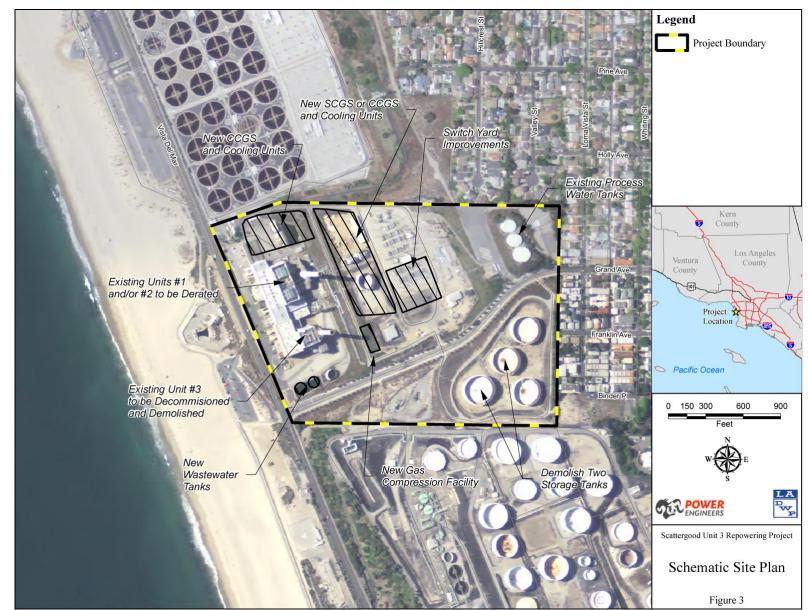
SGS UNIT 3 REPOWERING CONCEPTUAL SITE PLAN
